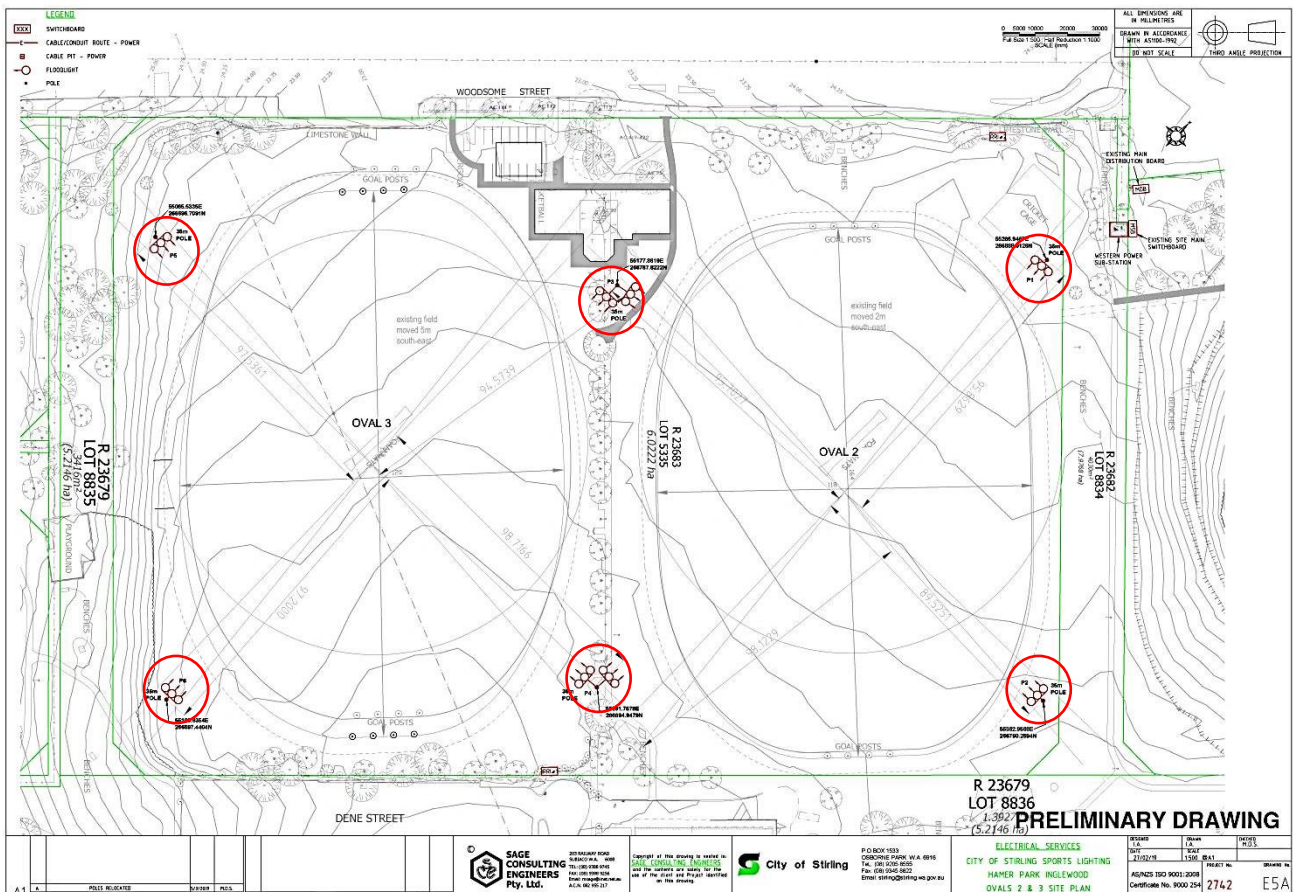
Hamer Park - Proposed Floodlight Pole Locations
